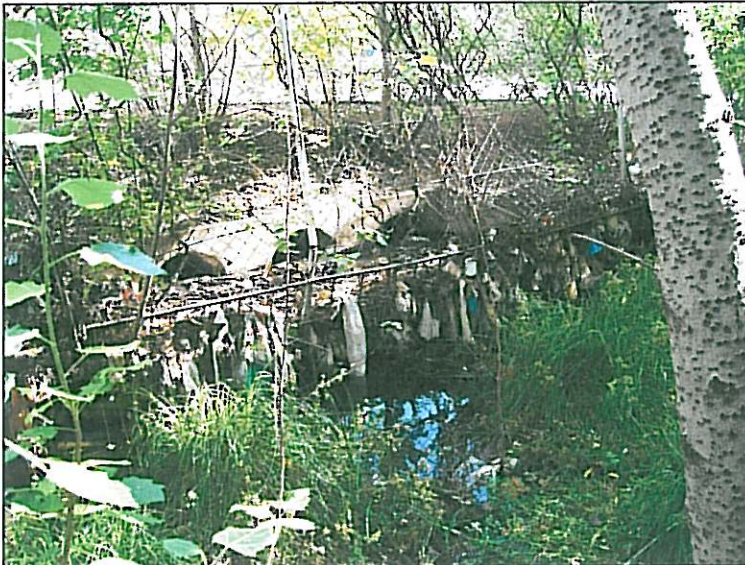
A prominent floodwater ditch enters the site at the south western corner.
